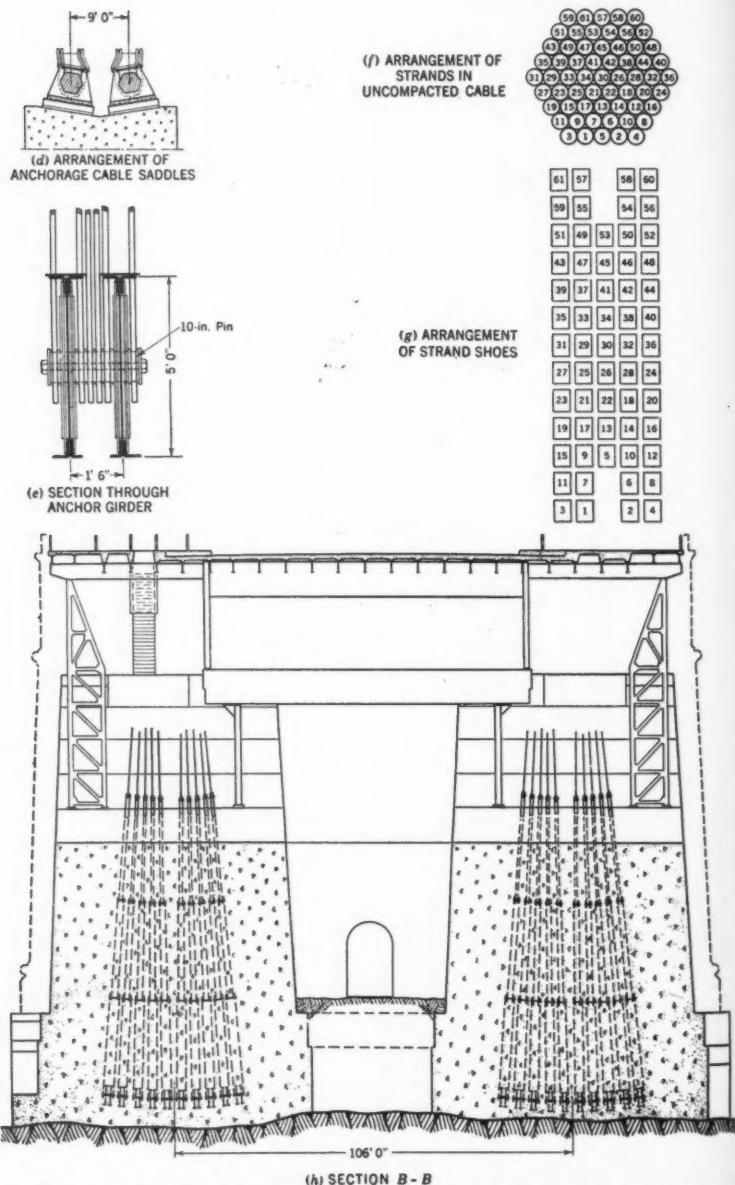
TYPICAL SECTIONS, NEW YORK ANCHORAGE (SEE, ALSO, FIGS. 4 AND 5).
